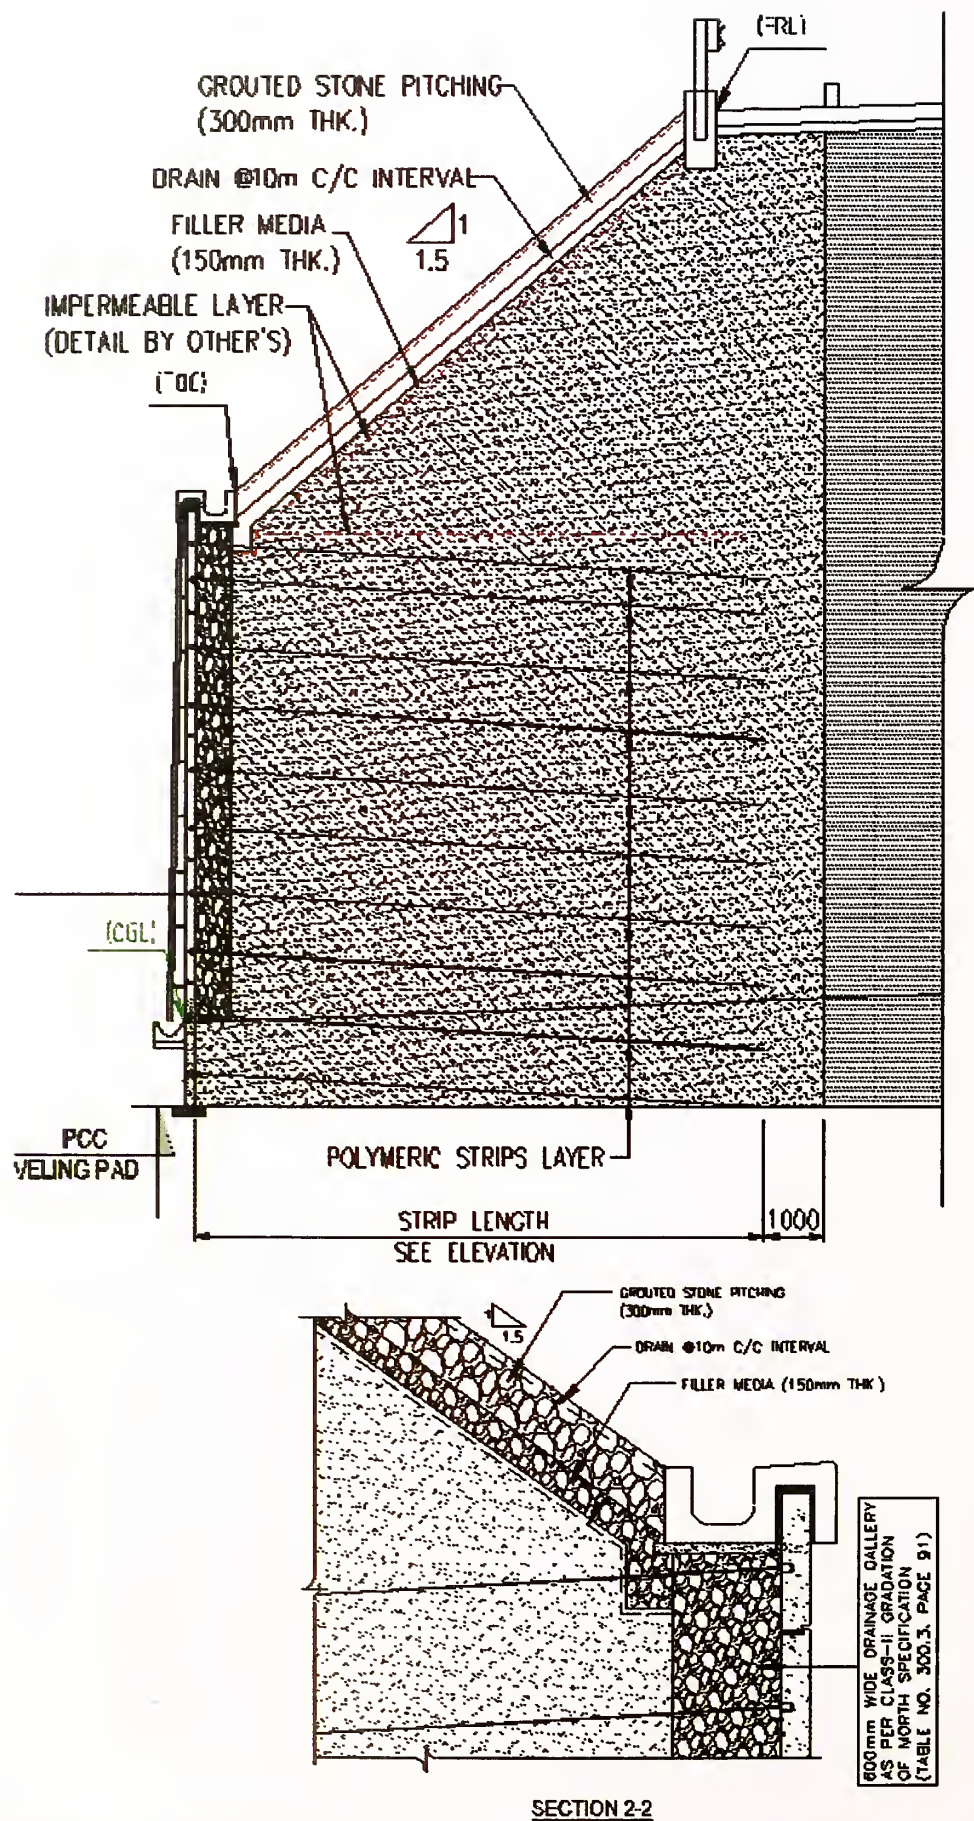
(a) Drainage Arrangement at the Top of Wall – Part Height Wall
